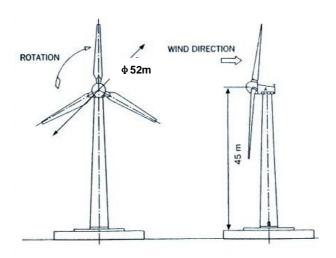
Typical Layout of a 600kW Class Wind Turbine
